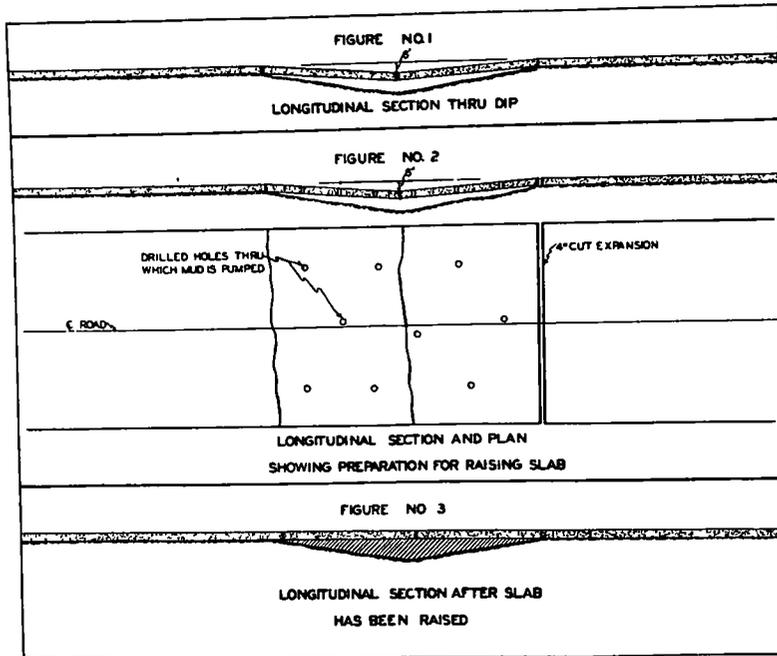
Sections of Pavement Settlement Showing the Original Condition, the Slab Prepared for Raising, and the Condition After the Slab has been Raised
